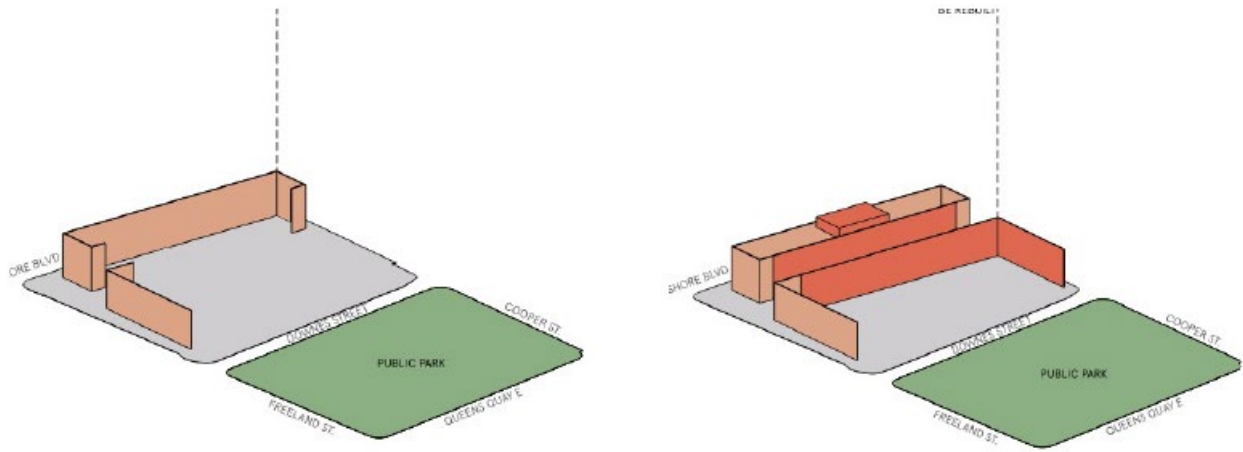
Diagram of retained elevations (left) and diagram of retained and reconstructed elevations (right), included for illustration purposes (Giaino + Associates Architects Inc., March 9, 2026).
